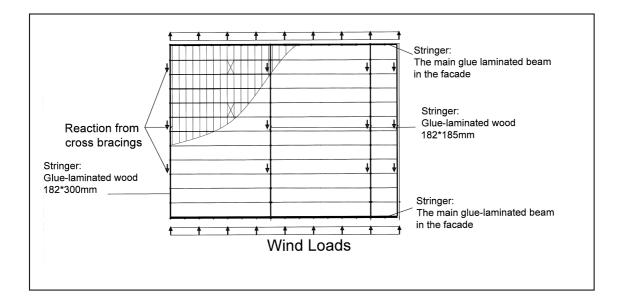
Plan: Roof diaphragm with wind loads in the transverse direction
